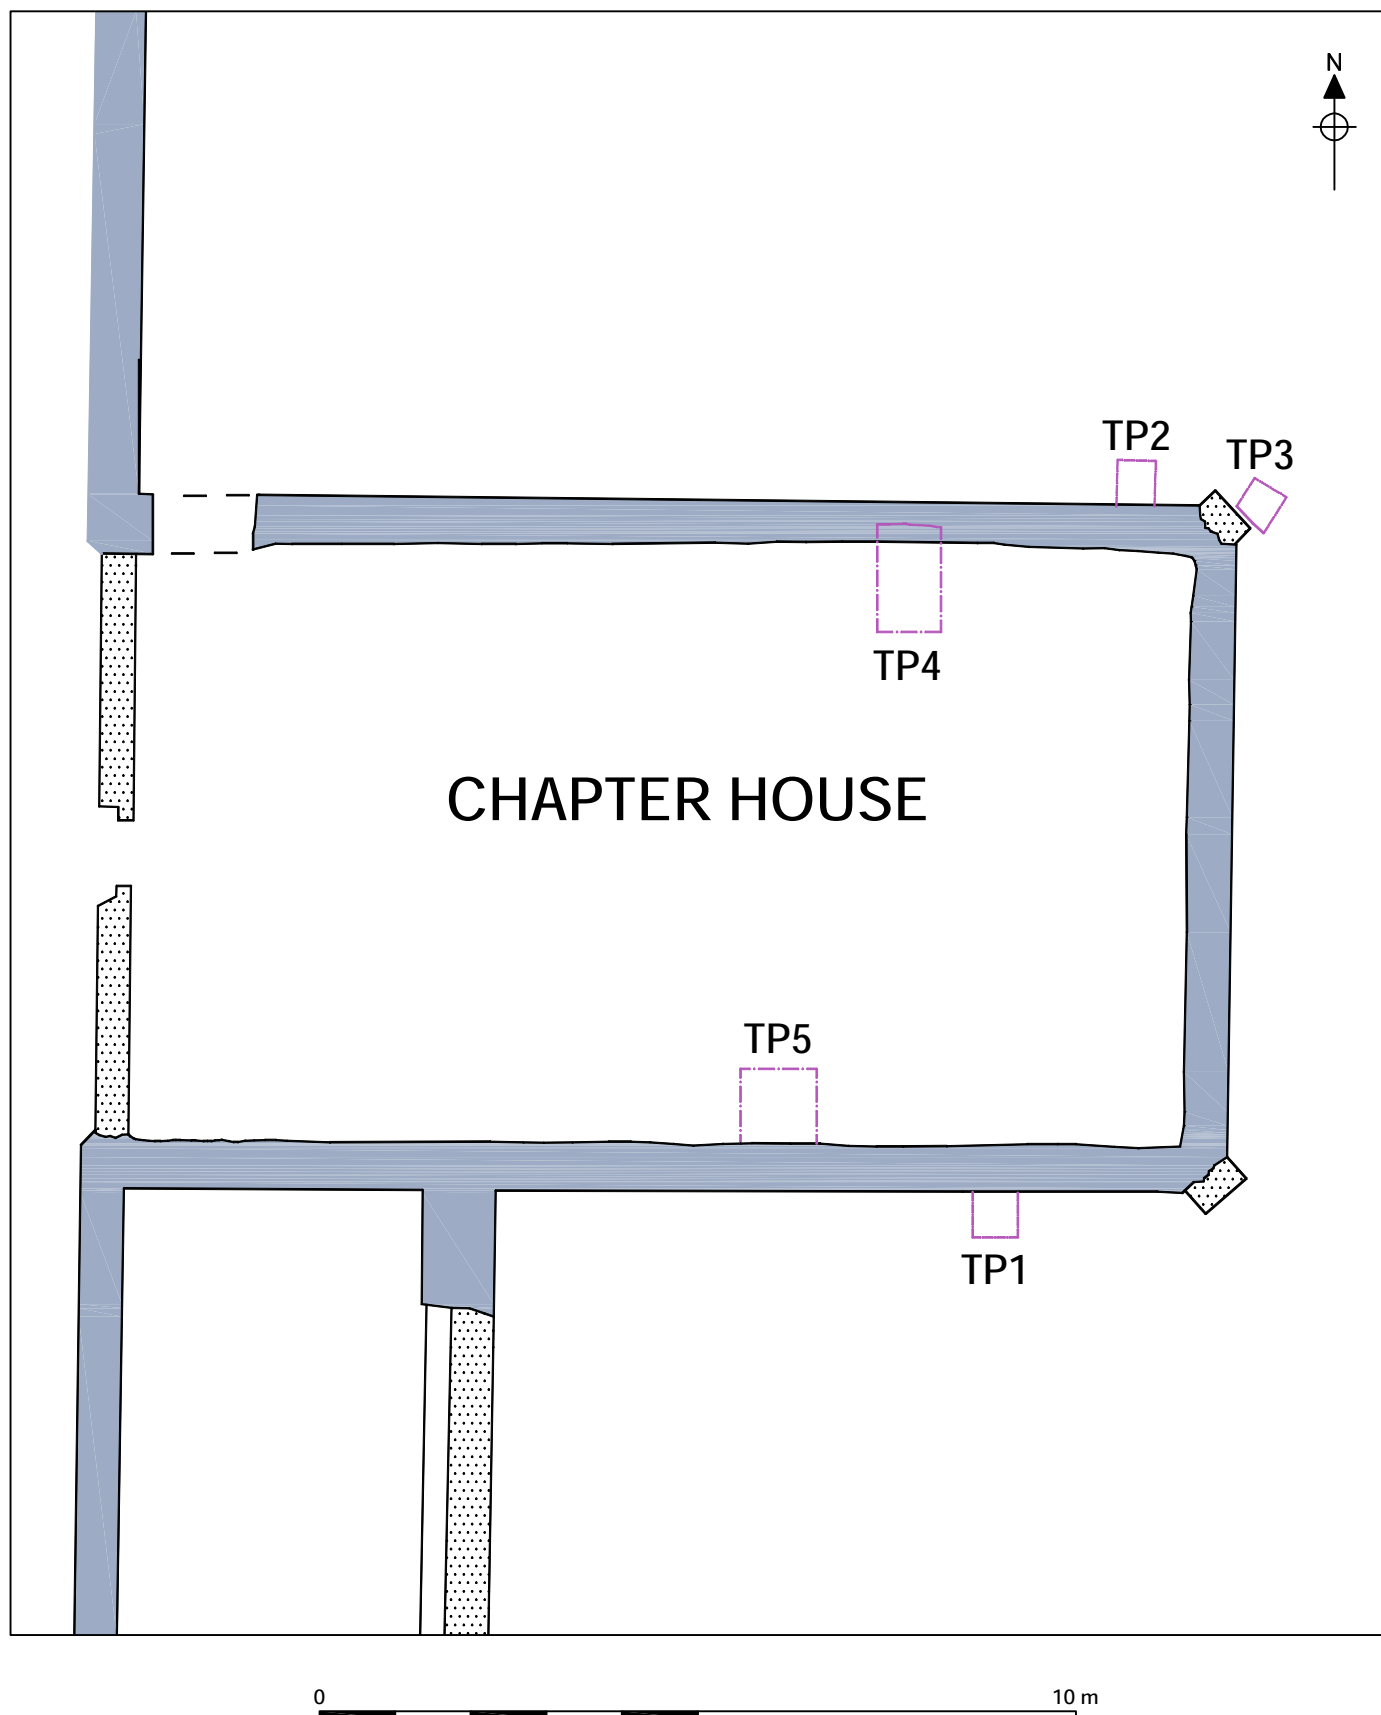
Test-Pit Location Plan (tied to A.R.Martin's Survey Plan of 1932). Scale 1:100
